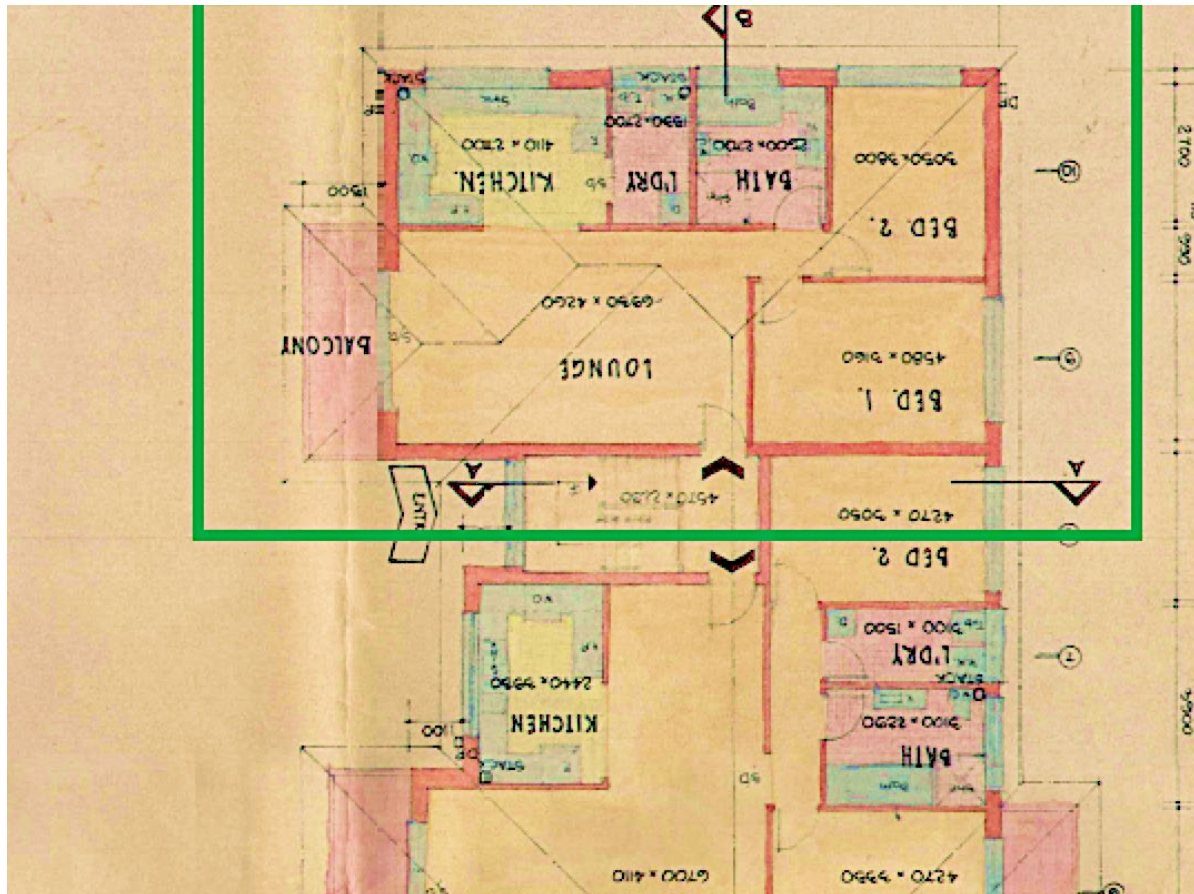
Floor plan of northern-most apartments at no. 44-48 Milton Street.
